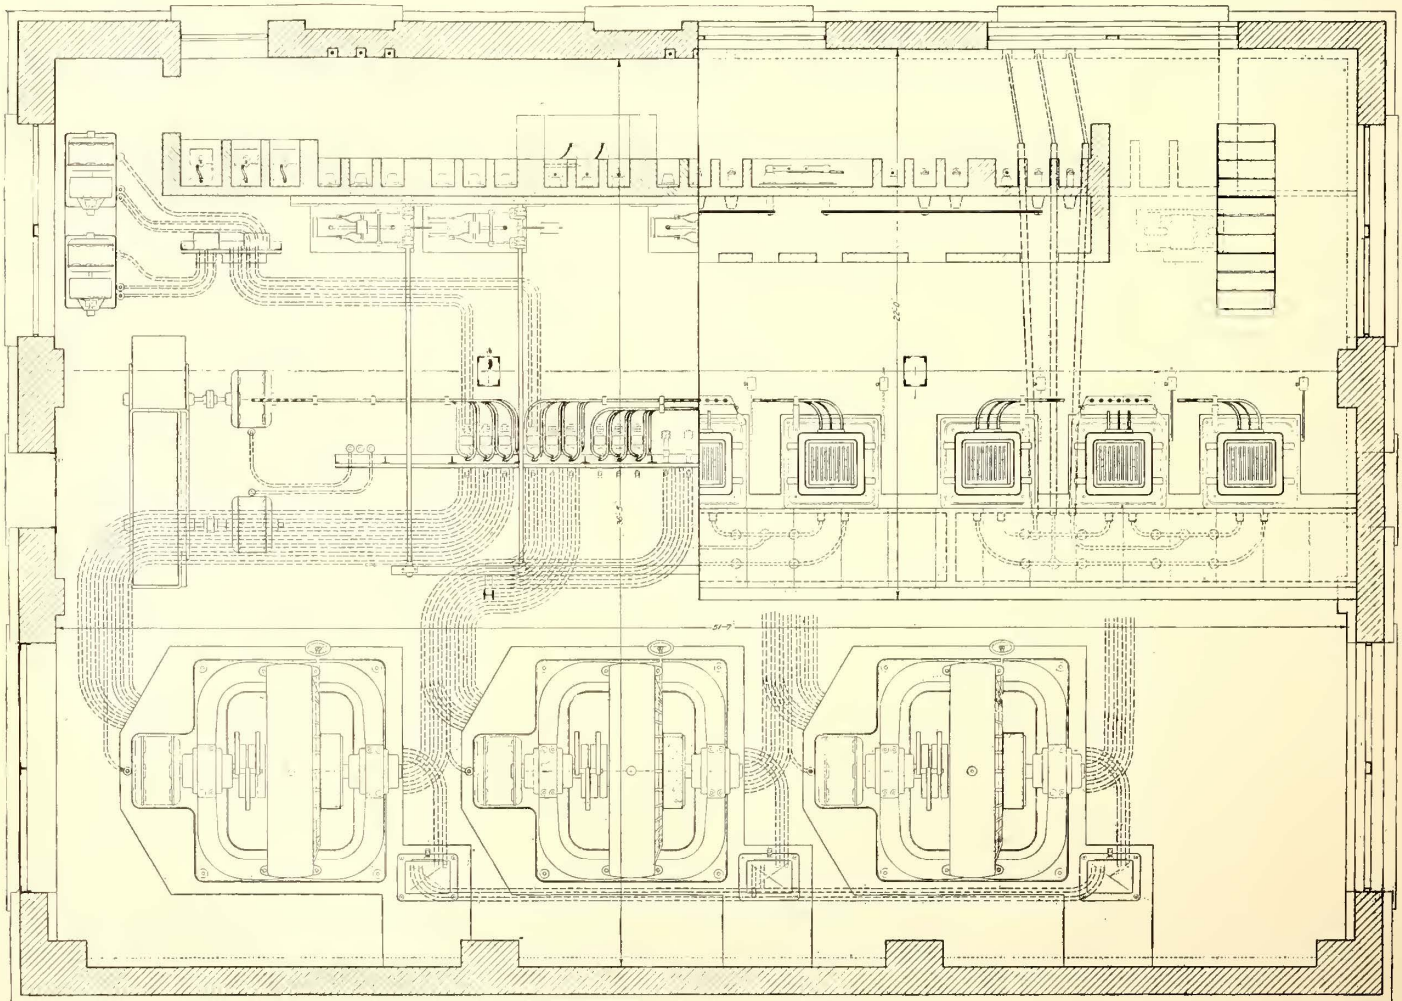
SECTIONAL PLAN, PUTNEY SUB-STATION
